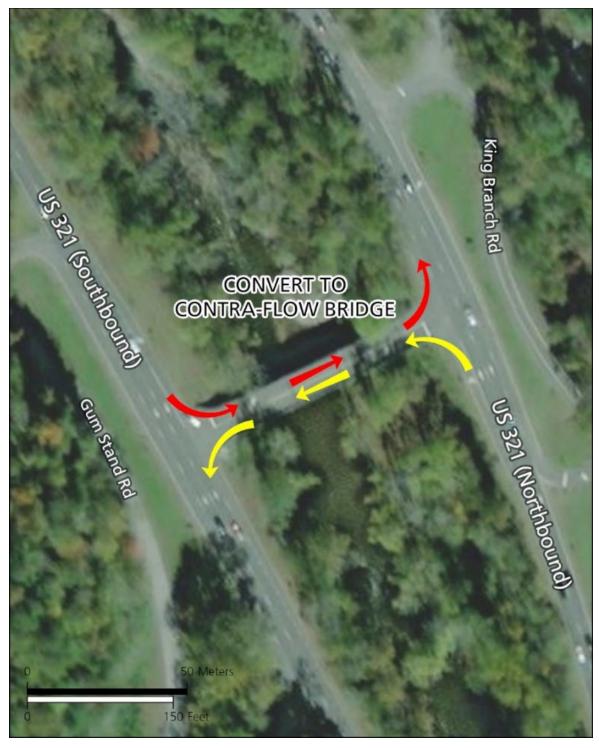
ALTERNATIVE 2—SUBAREA 1 PROPOSED CONTRA-FLOW BRIDGE
